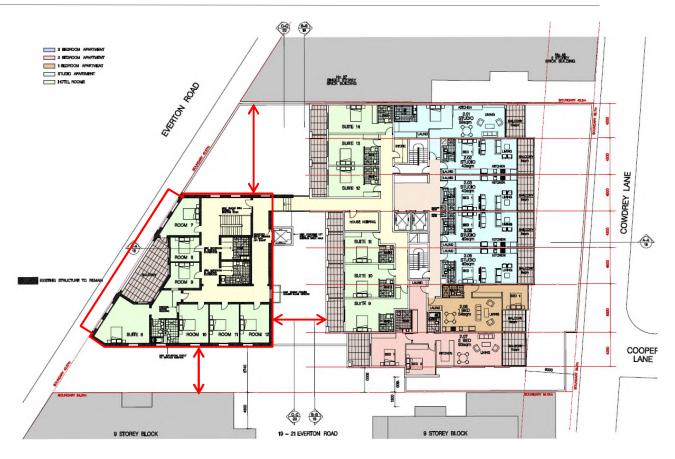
Level 2 Plan showing Major Addition set well to the rear of The Hotel Core (Retained). The setback behind the retained Hotel Core is arrowed.
